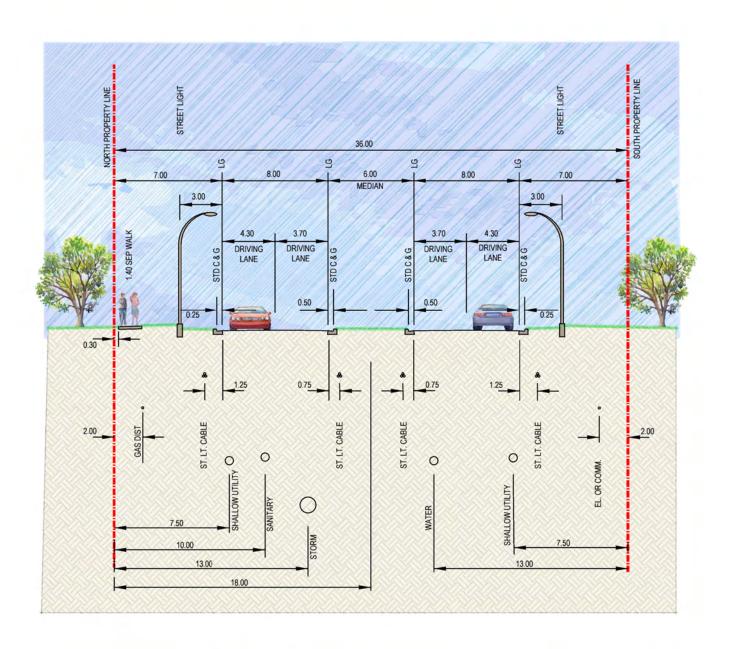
ROAD SECTION NOSE CREEK BOULEVARD
